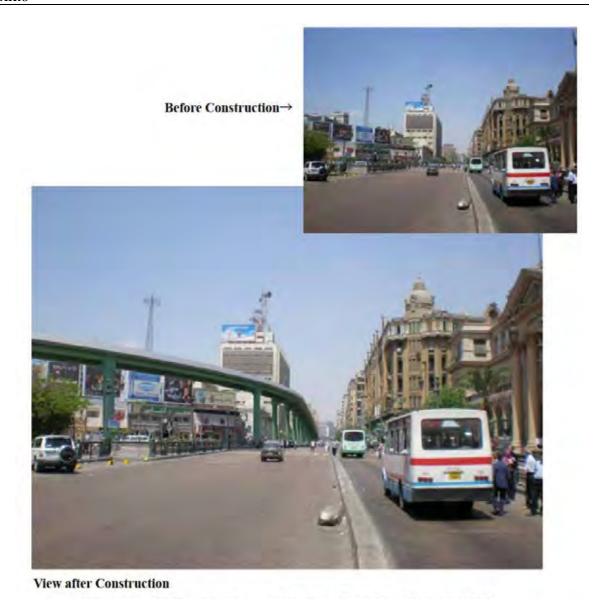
Montage Photos assuming Expressway is constructed beside Protected Buildings
